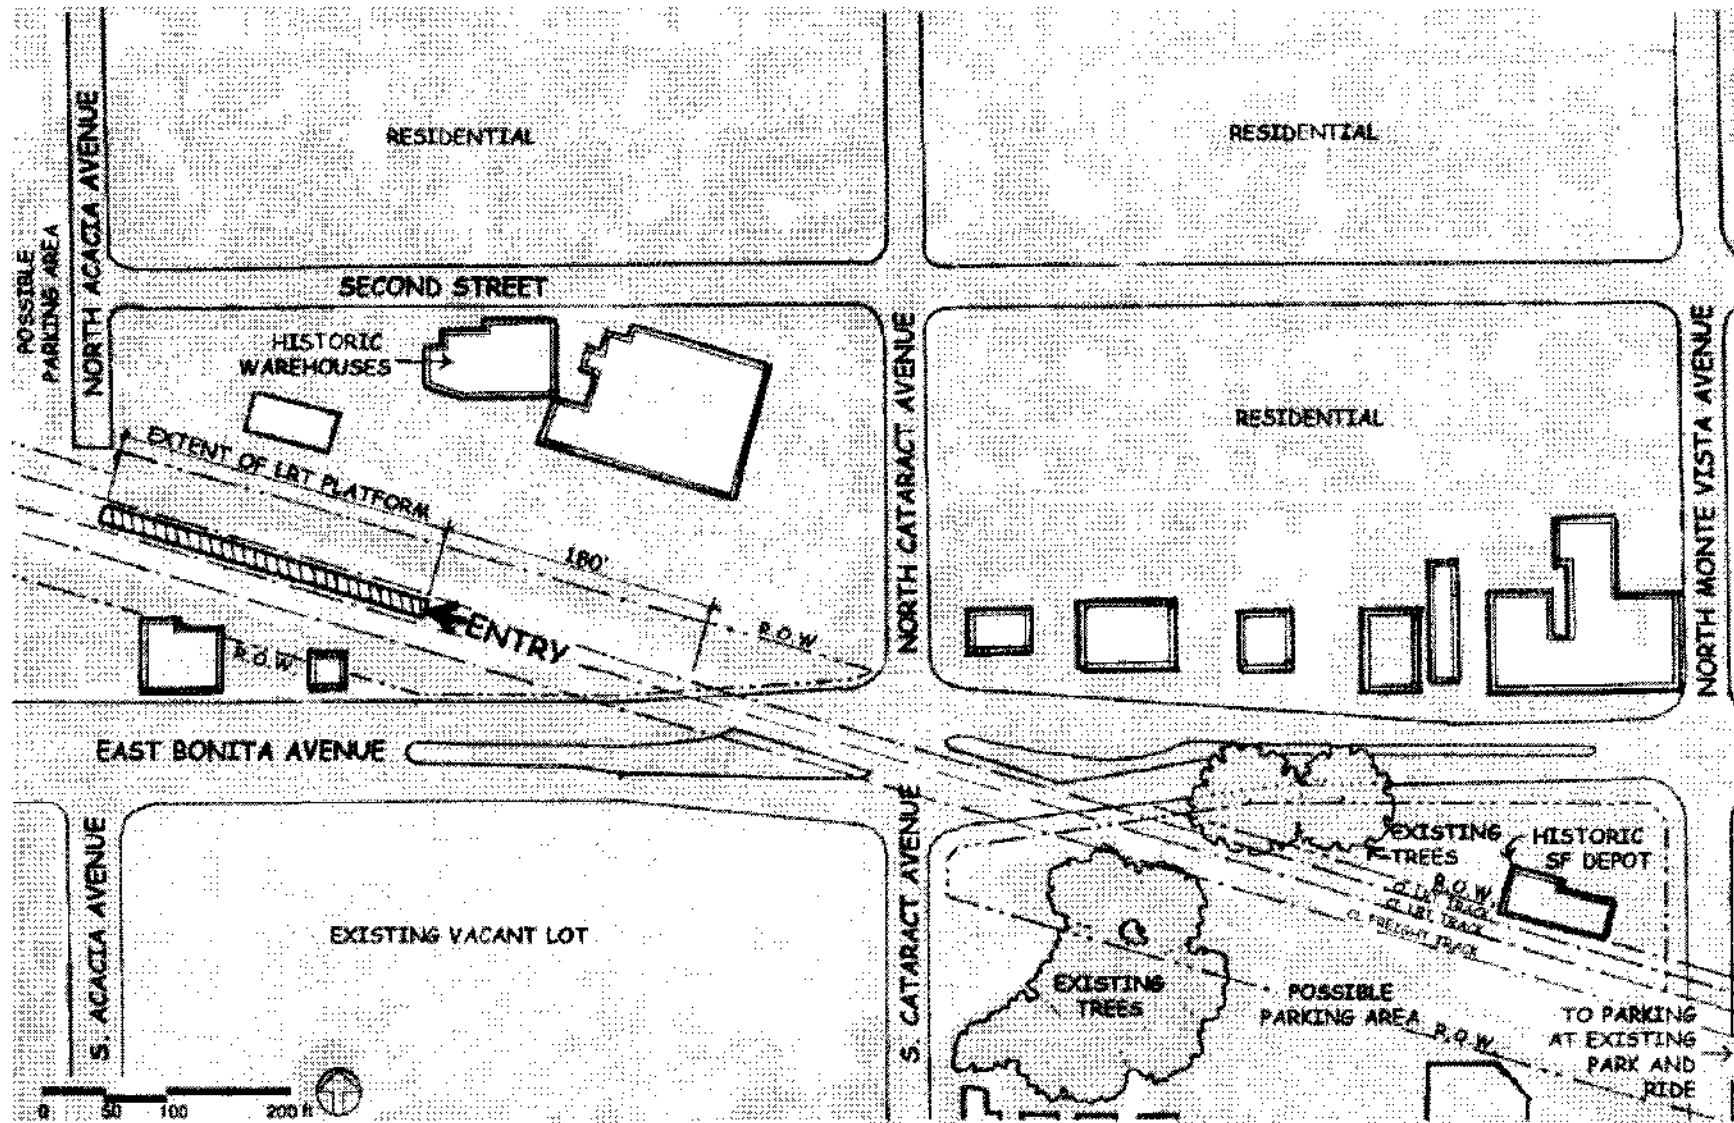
Site Plan: City of San Dimas Station, 3-Track Alternative
